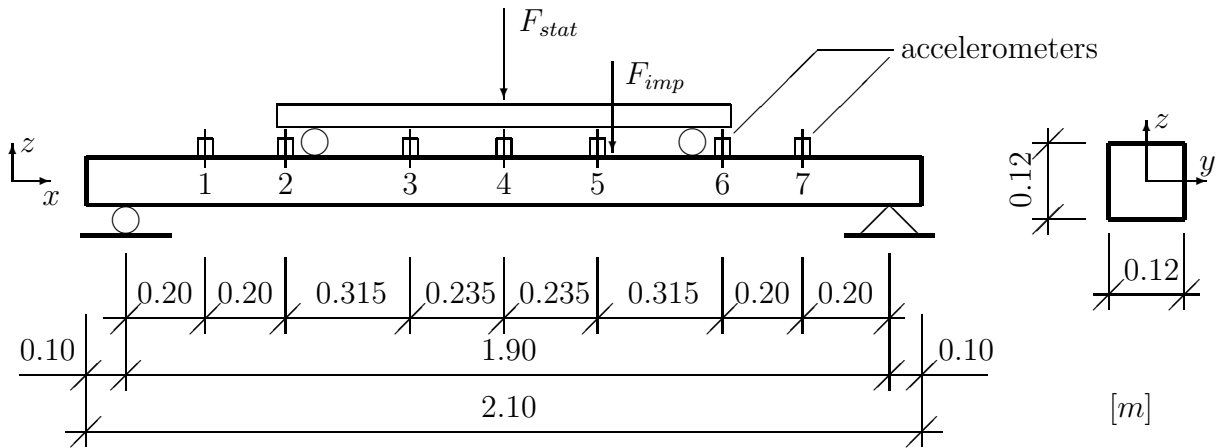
Test set-up, simply supported reinforced concrete beam
